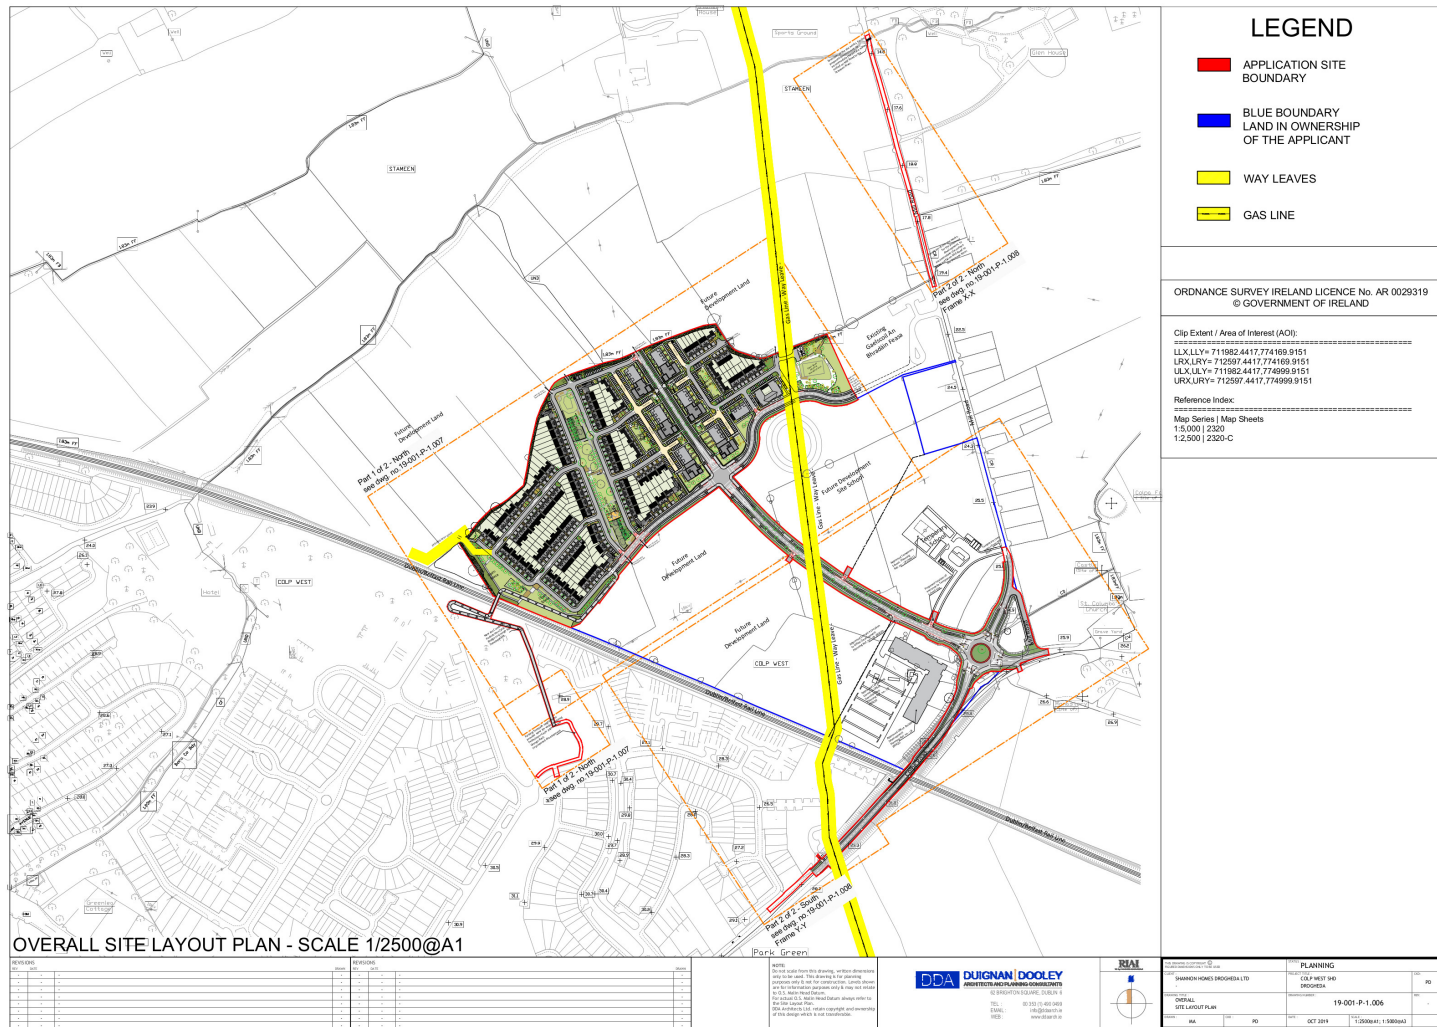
Site Layout (in red line) within the wider masterplan area.
